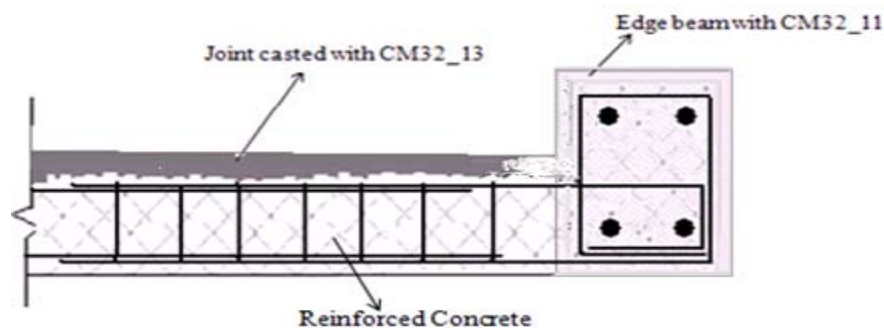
Proposed Cross Section of Edge beam and overlay casted with UHPFRC
